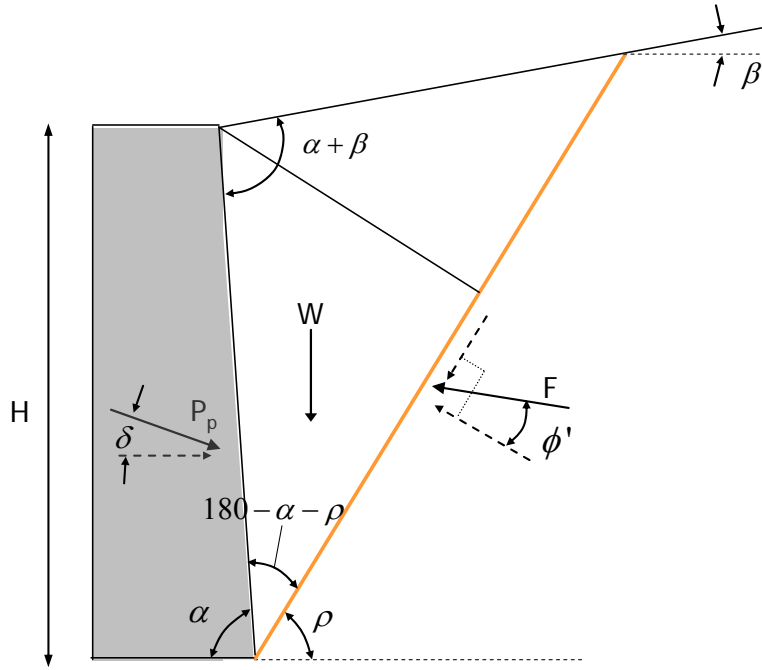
Schematic forces acting on a retaining/abutment wall
